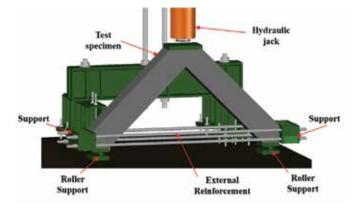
Schematic of test setup and specimen with supports (truss-like specimen shown)
